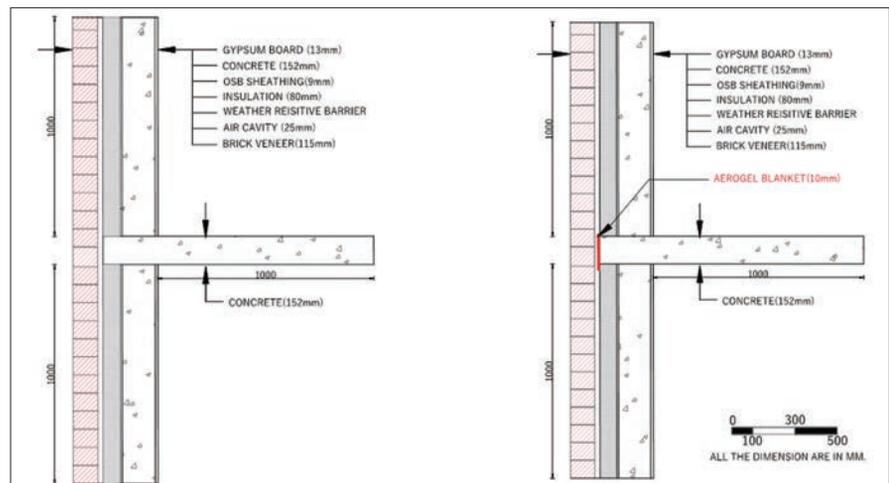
Wall and floor connection with concrete structure (standard on the left, improved on the right).
